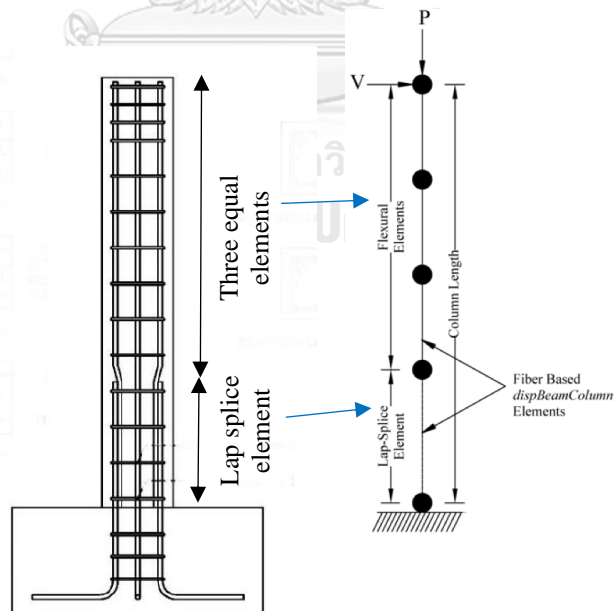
Element discretization of control column tested by Kruavit [76] (lap splice element is 700 mm long and each flexural element outside lap splice is 500 mm long).
